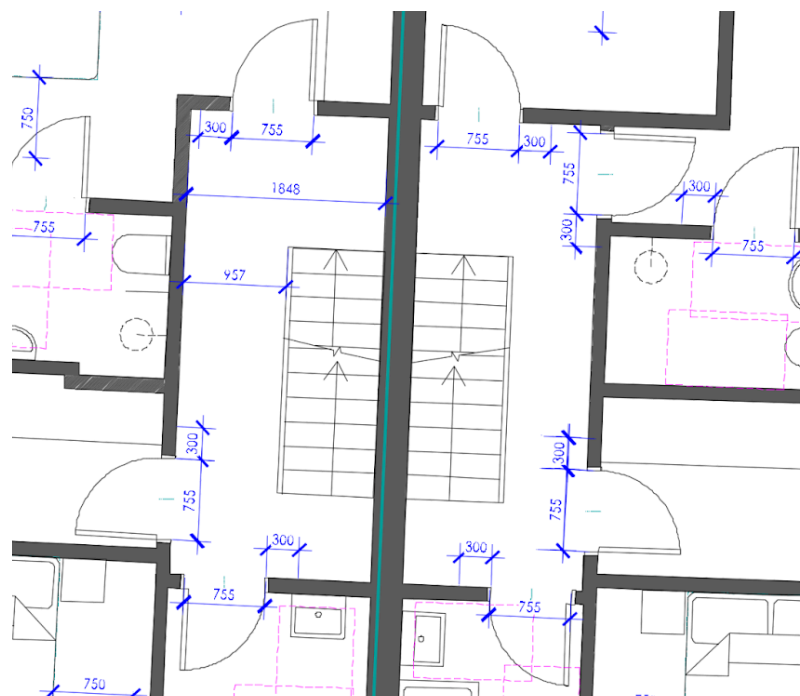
Sample plan of the proposed first floor circulation space, min 1848mm wide. Extract from drawing 2041.03.03.Plh01.022.
